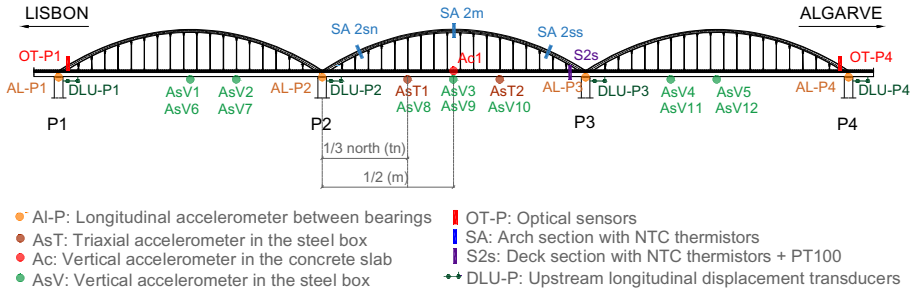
The SHM system of the railway bridge over the Sado River.
